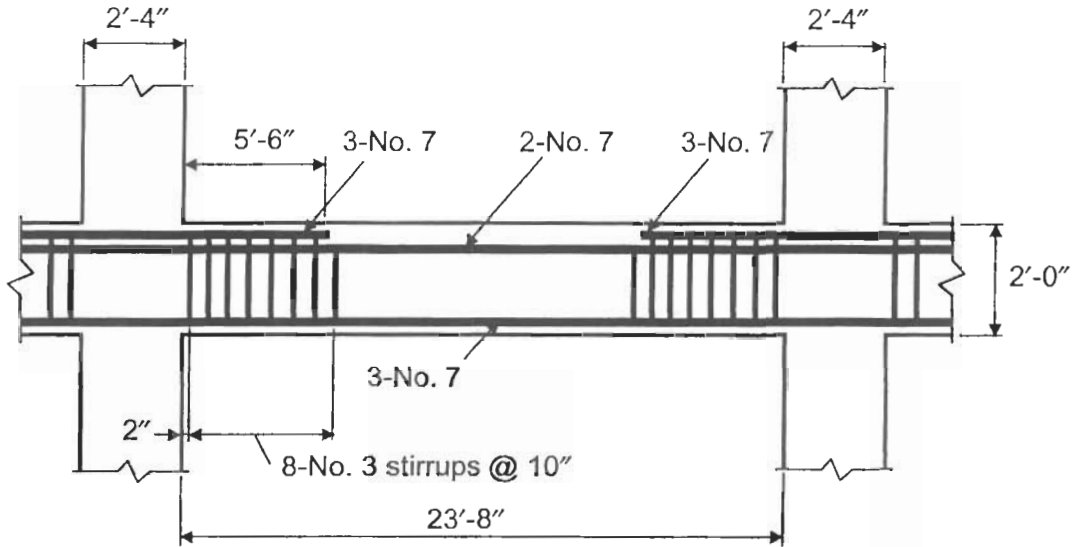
Reinforcement Details for Beam C4-C5 at the 2<sup>nd</sup> Floor Level (SDC A)
